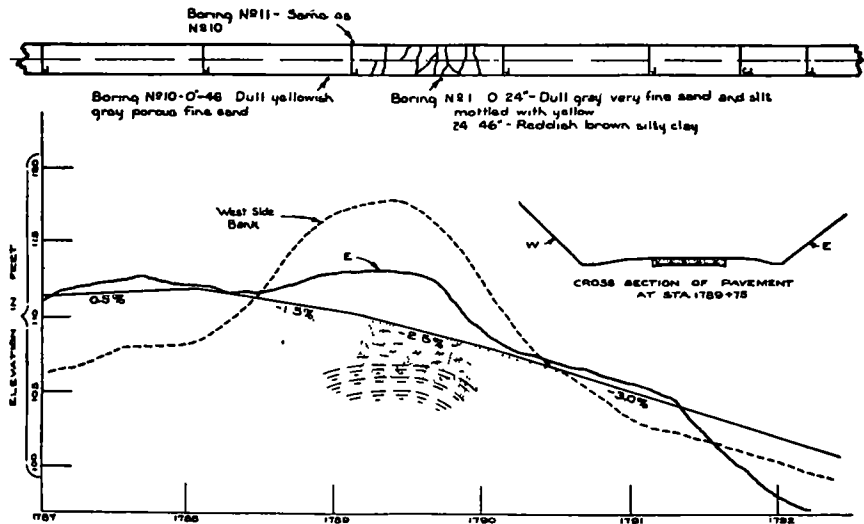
Frost Action in Very Fine Sand and Silt Causes Excessive Pavement Cracking
